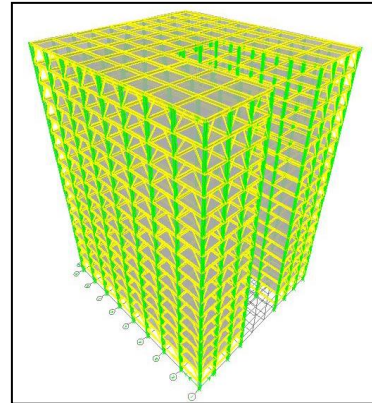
3D model of G+16 storey building with Inverted K bracing.
